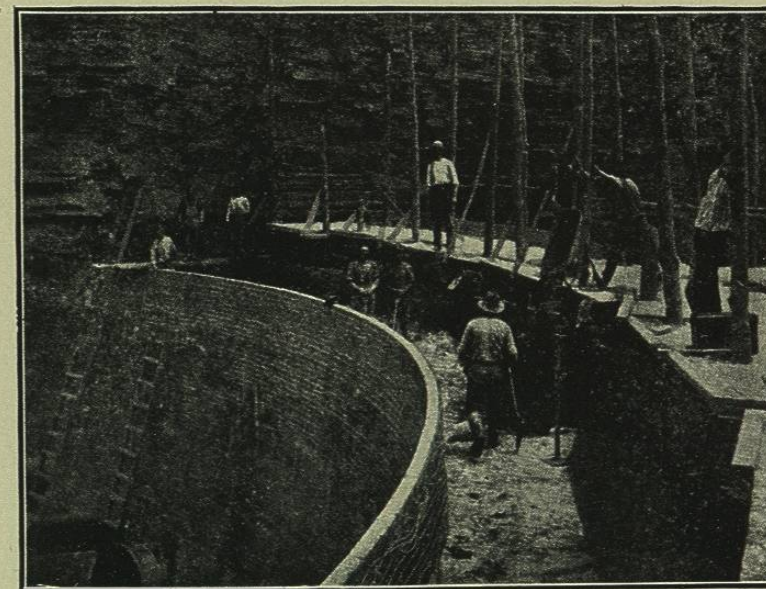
ITHACA DAM, NEW YORK, ILLUSTRATING CONCRETE CONSTRUCTION BETWEEN BRICK-FACING FORMS.
